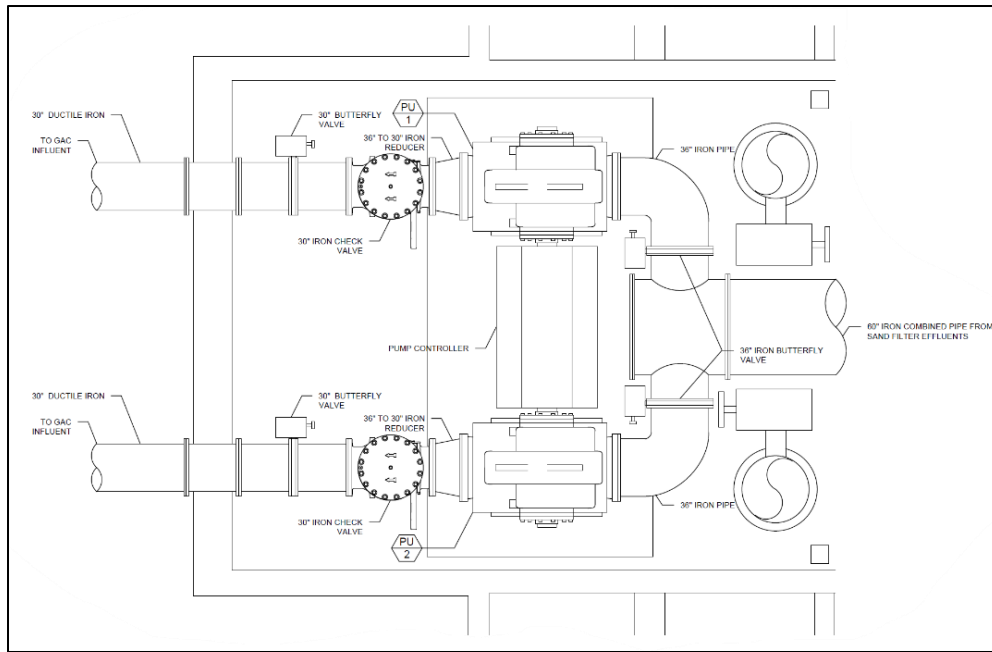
GAC service pump detail from Forefront Consulting drawing set page 12, Appendix 9.6
